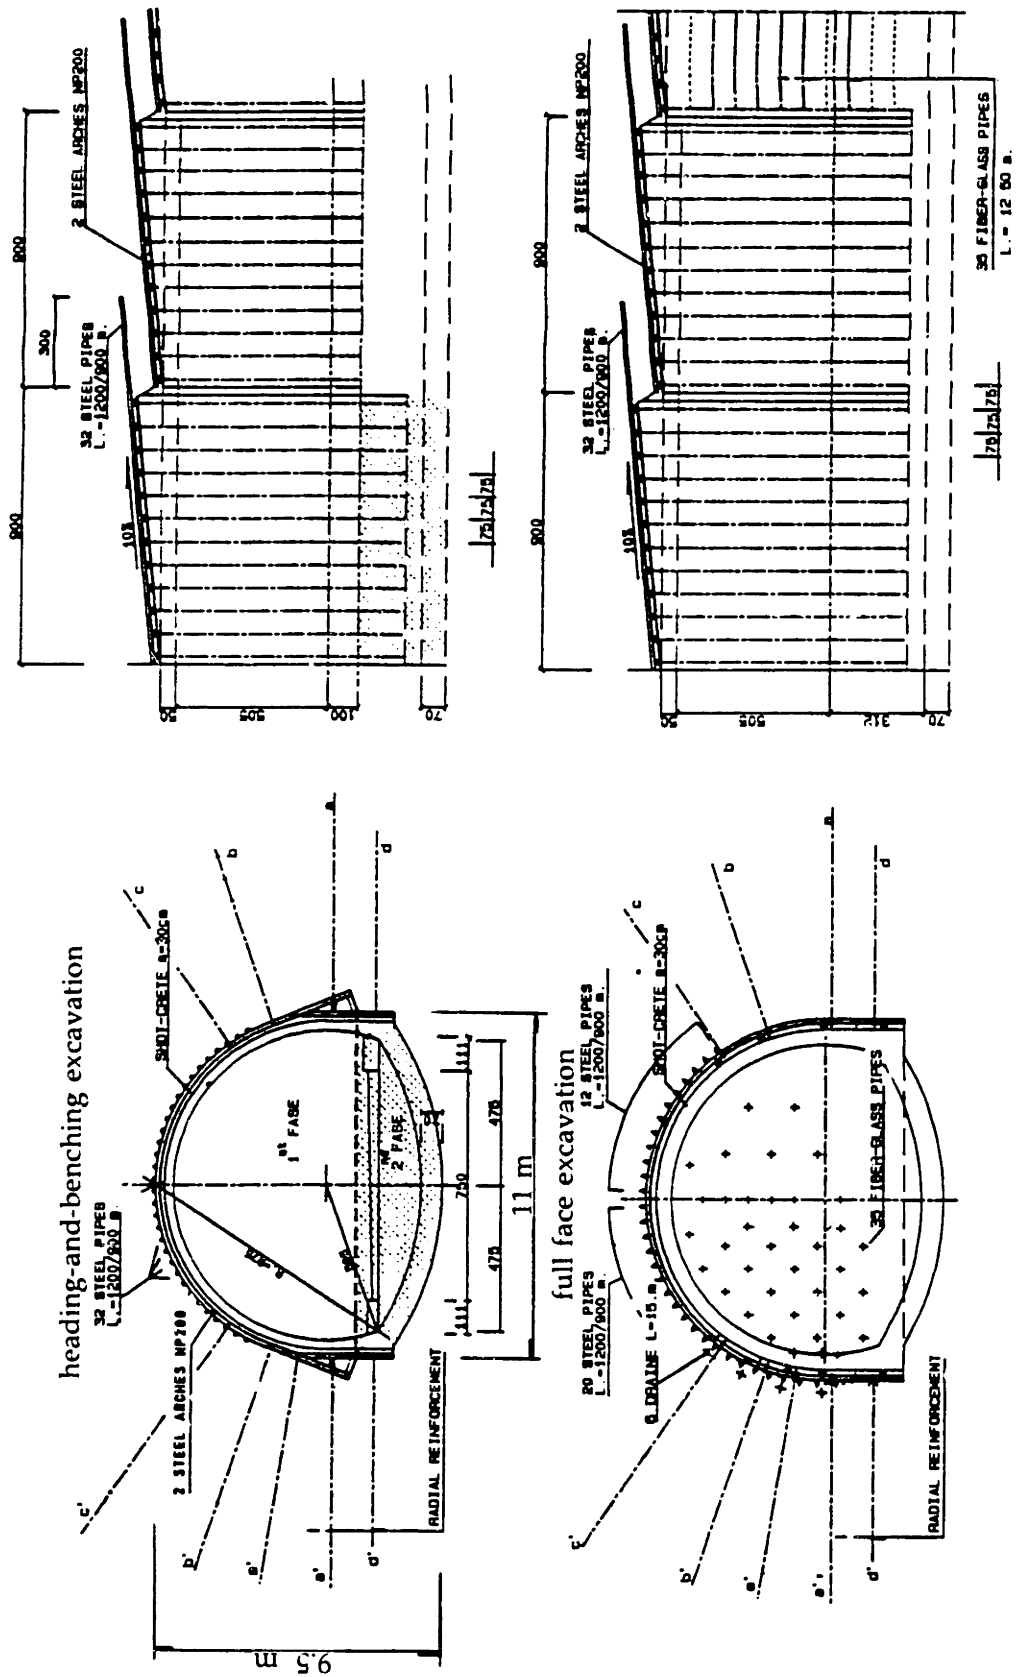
Cross and longitudinal sections: Poggio Formello Tunnel (Pelizza et al., 1994)
